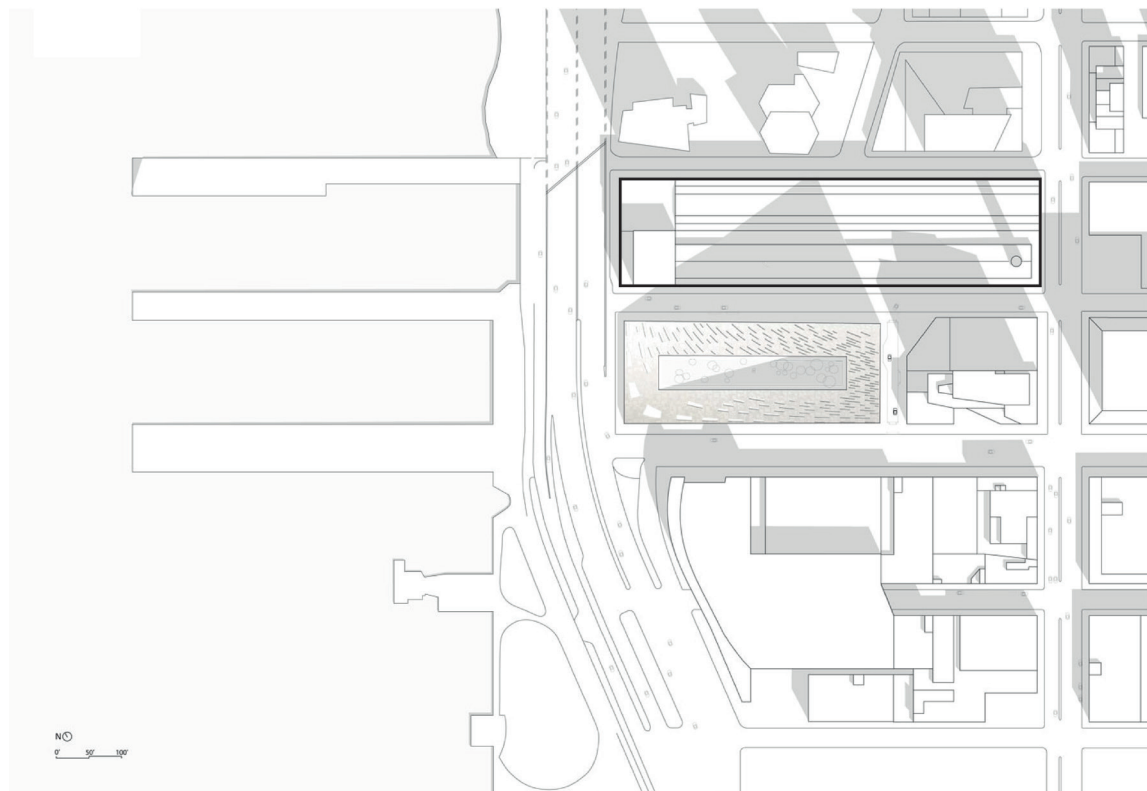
Possible overcasting shadows from surrounded buildings.
